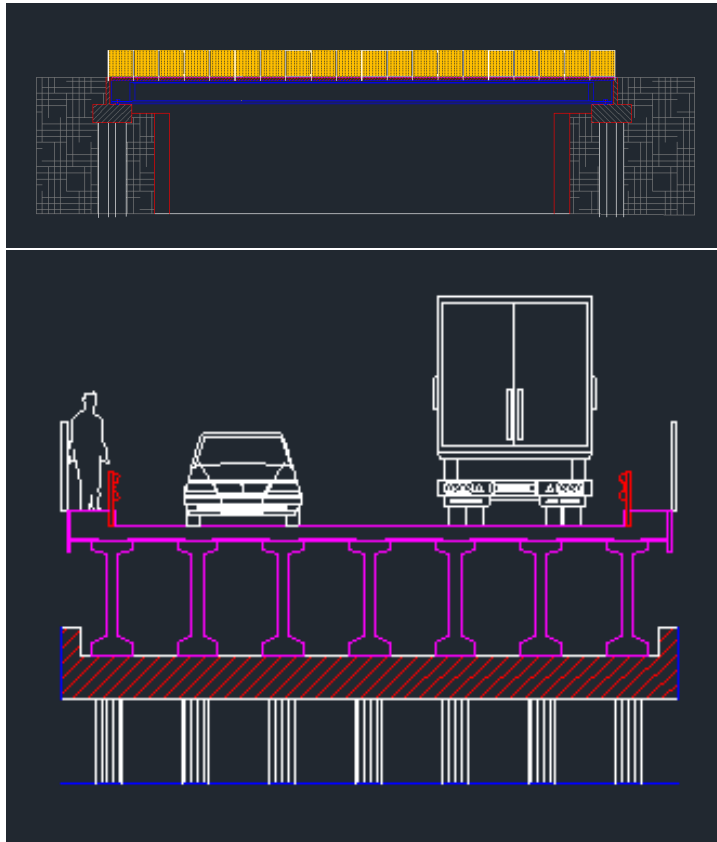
Fiume di Mare Bridge: longitudinal section and cross section
